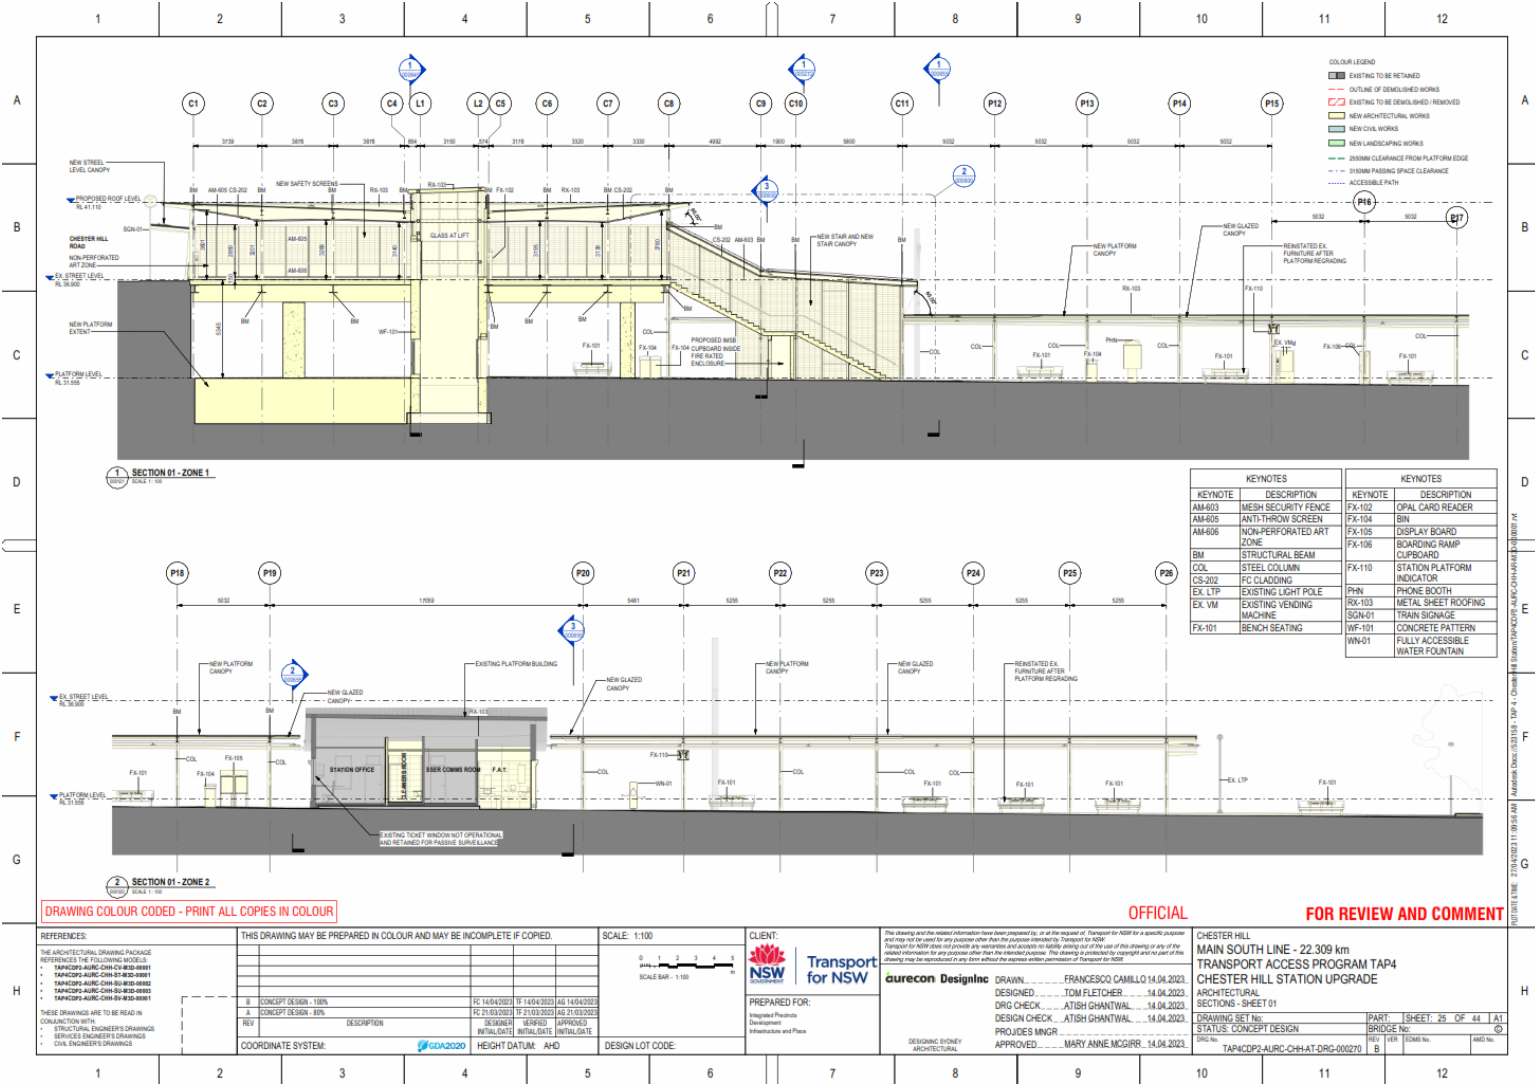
Sections sheet 1 Chester Hill Station (Source: Aurecon 2024)
